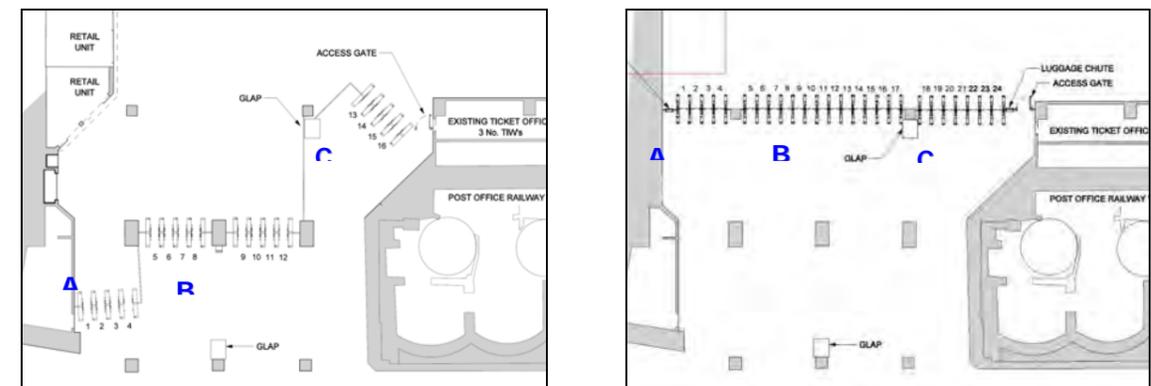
Ticket Hall B – Gateline Configuration Existing (left), Proposed (right)
